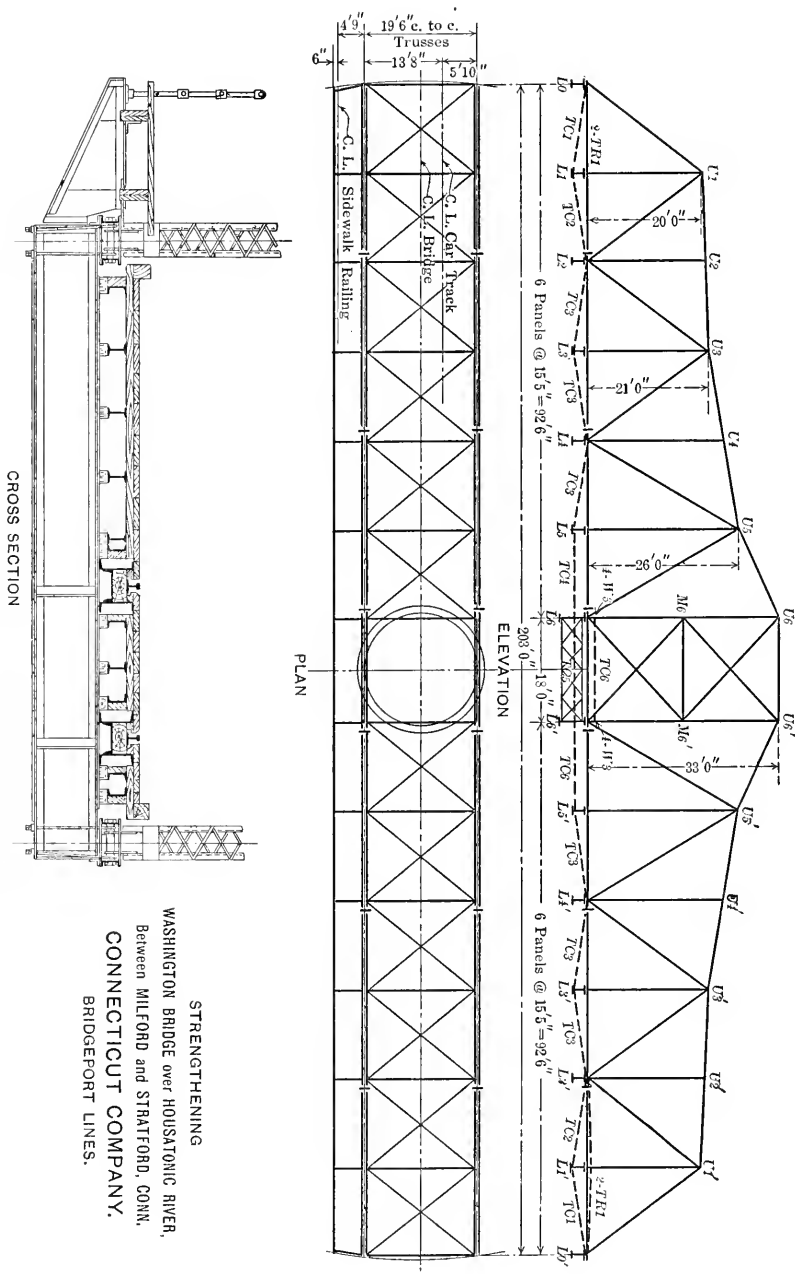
ELEVATION, PLAN AND CROSS SECTION, SWING SPAN, WASHINGTON BRIDGE.
